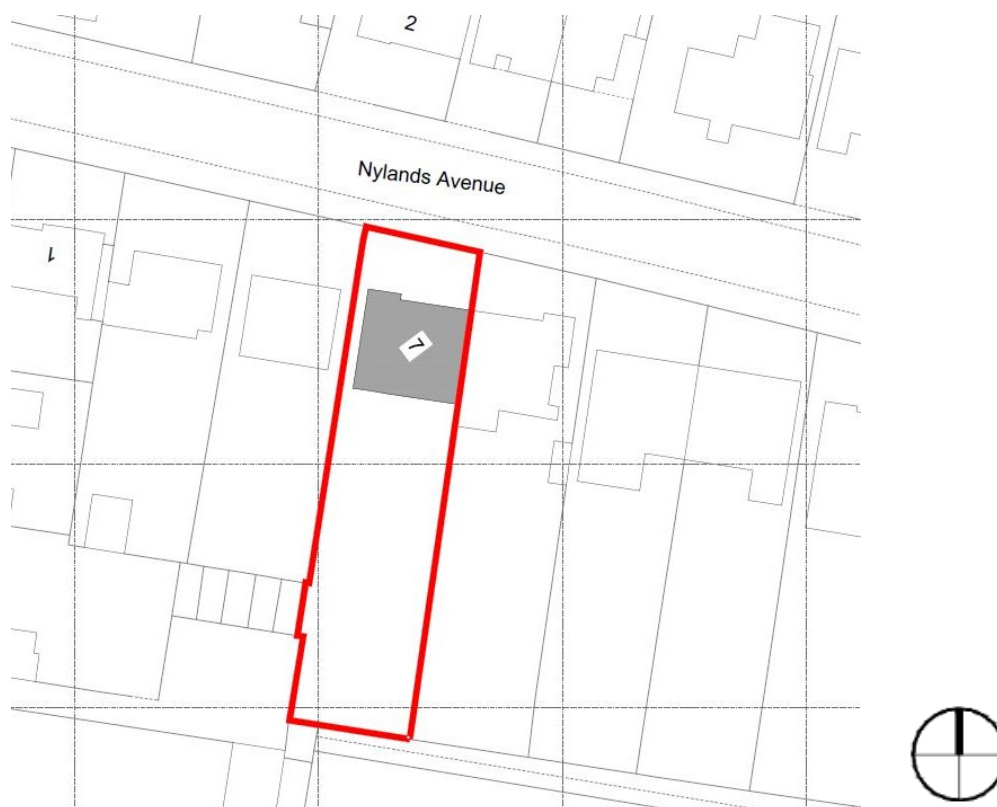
Site location plan showing the site and buildings in context. For reference only. Not to scale.
